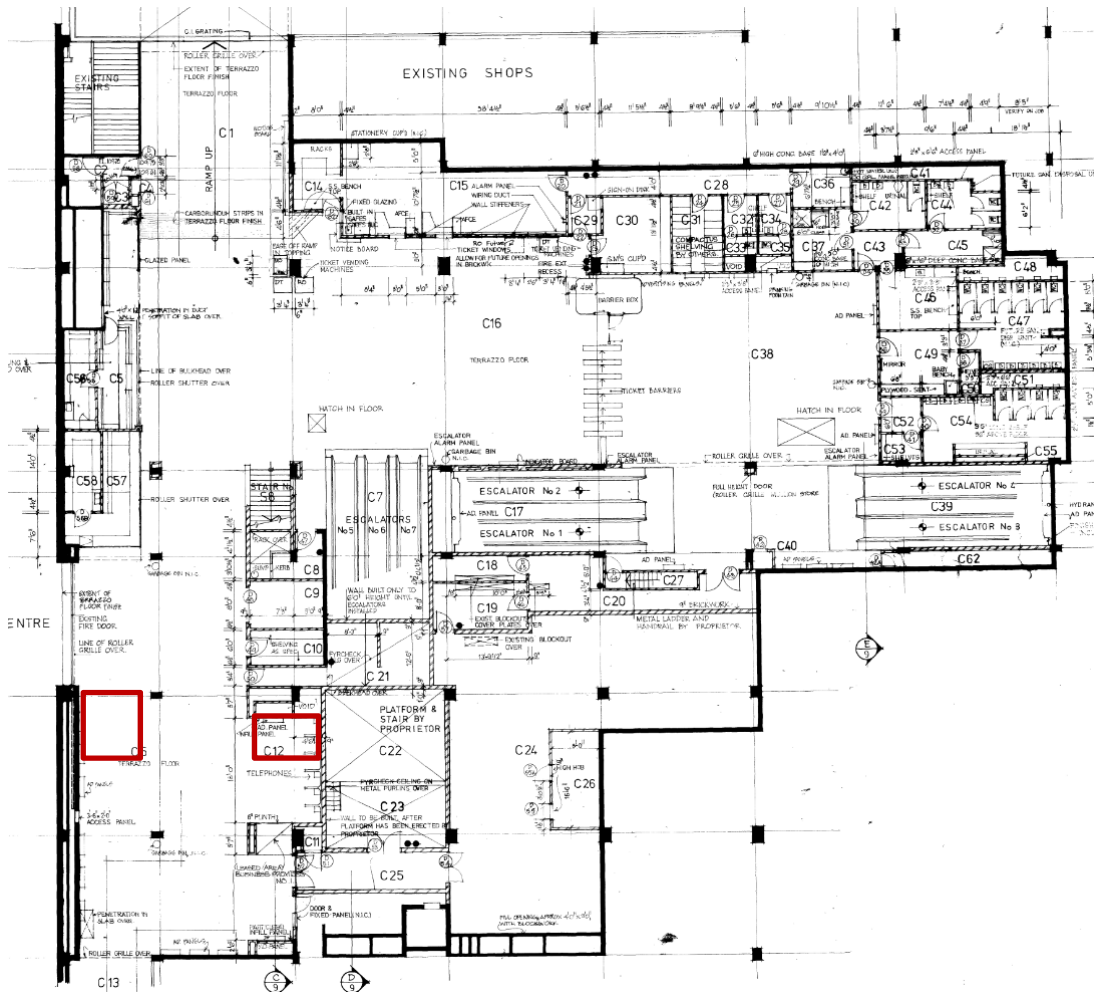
Original plan of Edgecliff Station Concourse level, showing shops, ticket barriers and other facilities (Plan 2296/8-E). Approximate area of proposed works shown in red.
